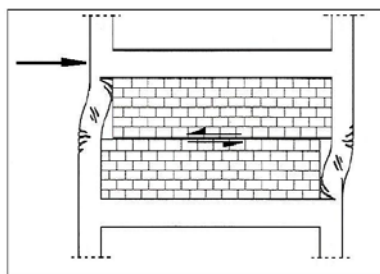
Behaviour of masonry infill wall frame under the lateral loads
